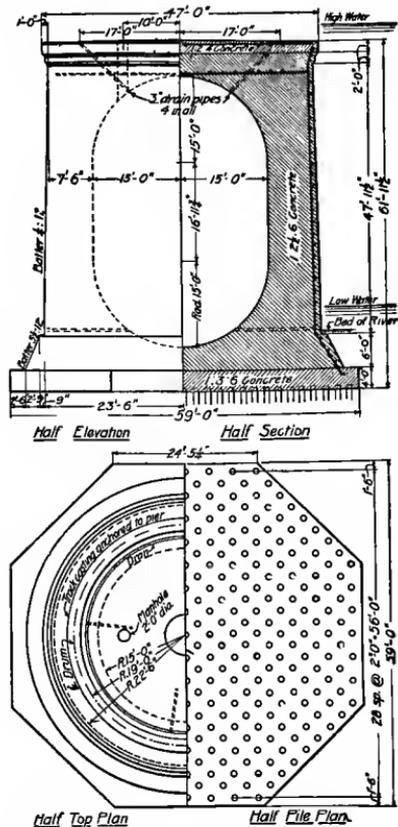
PIVOT PIER, ILLINOIS CENTRAL R.R.
